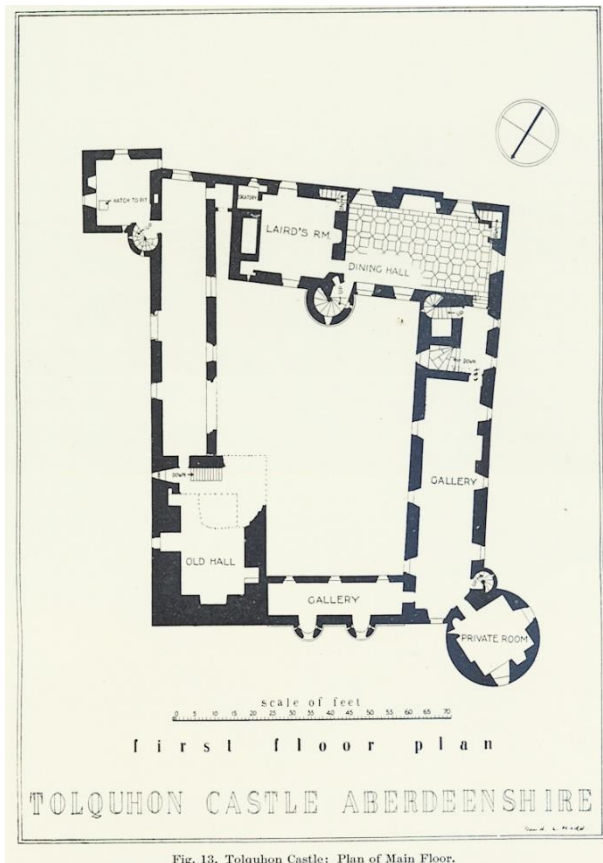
Tolquhon Castle: Plan of Main Floor.
